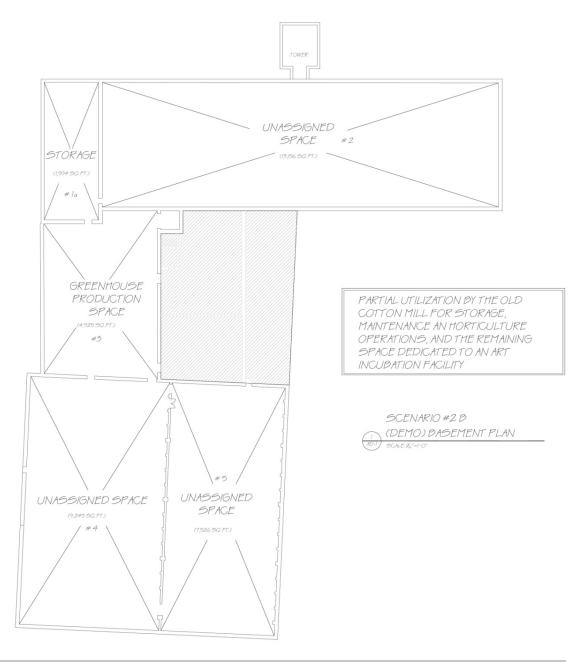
Retail and Storage operation - Option 2B Basement Plan
